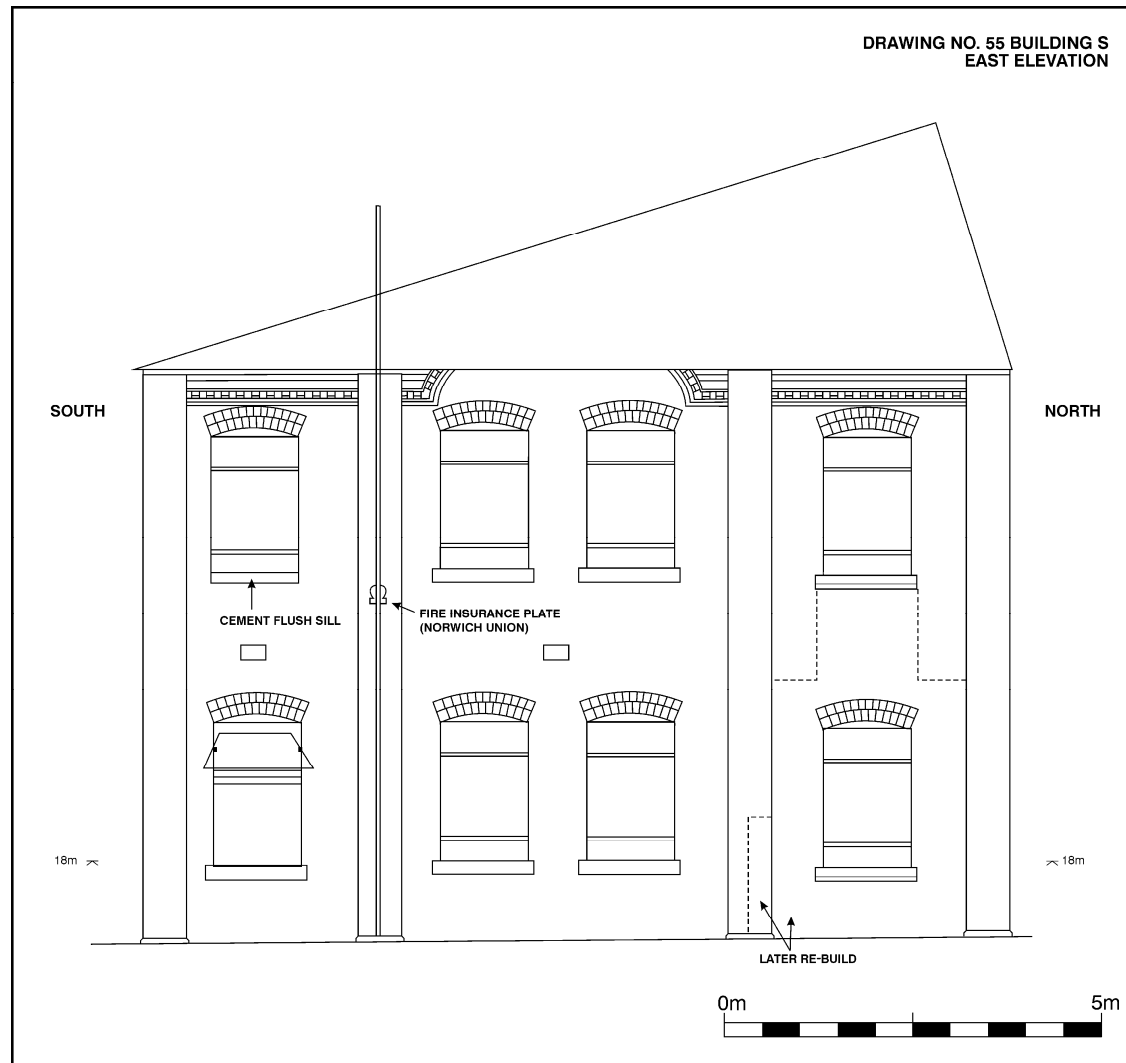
Survey drawing of the east elevation of Building S (scale 1:100)
